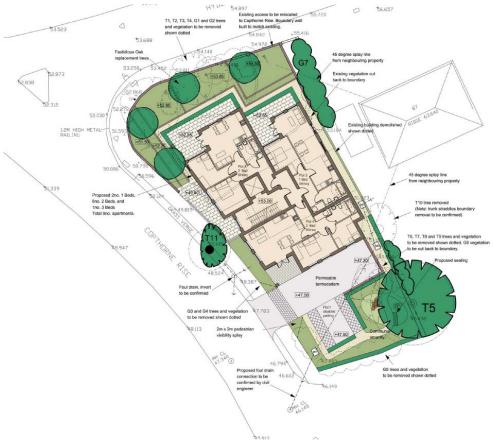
Site Plan (Ground Floor) in relation to no.87 Hyde Road
